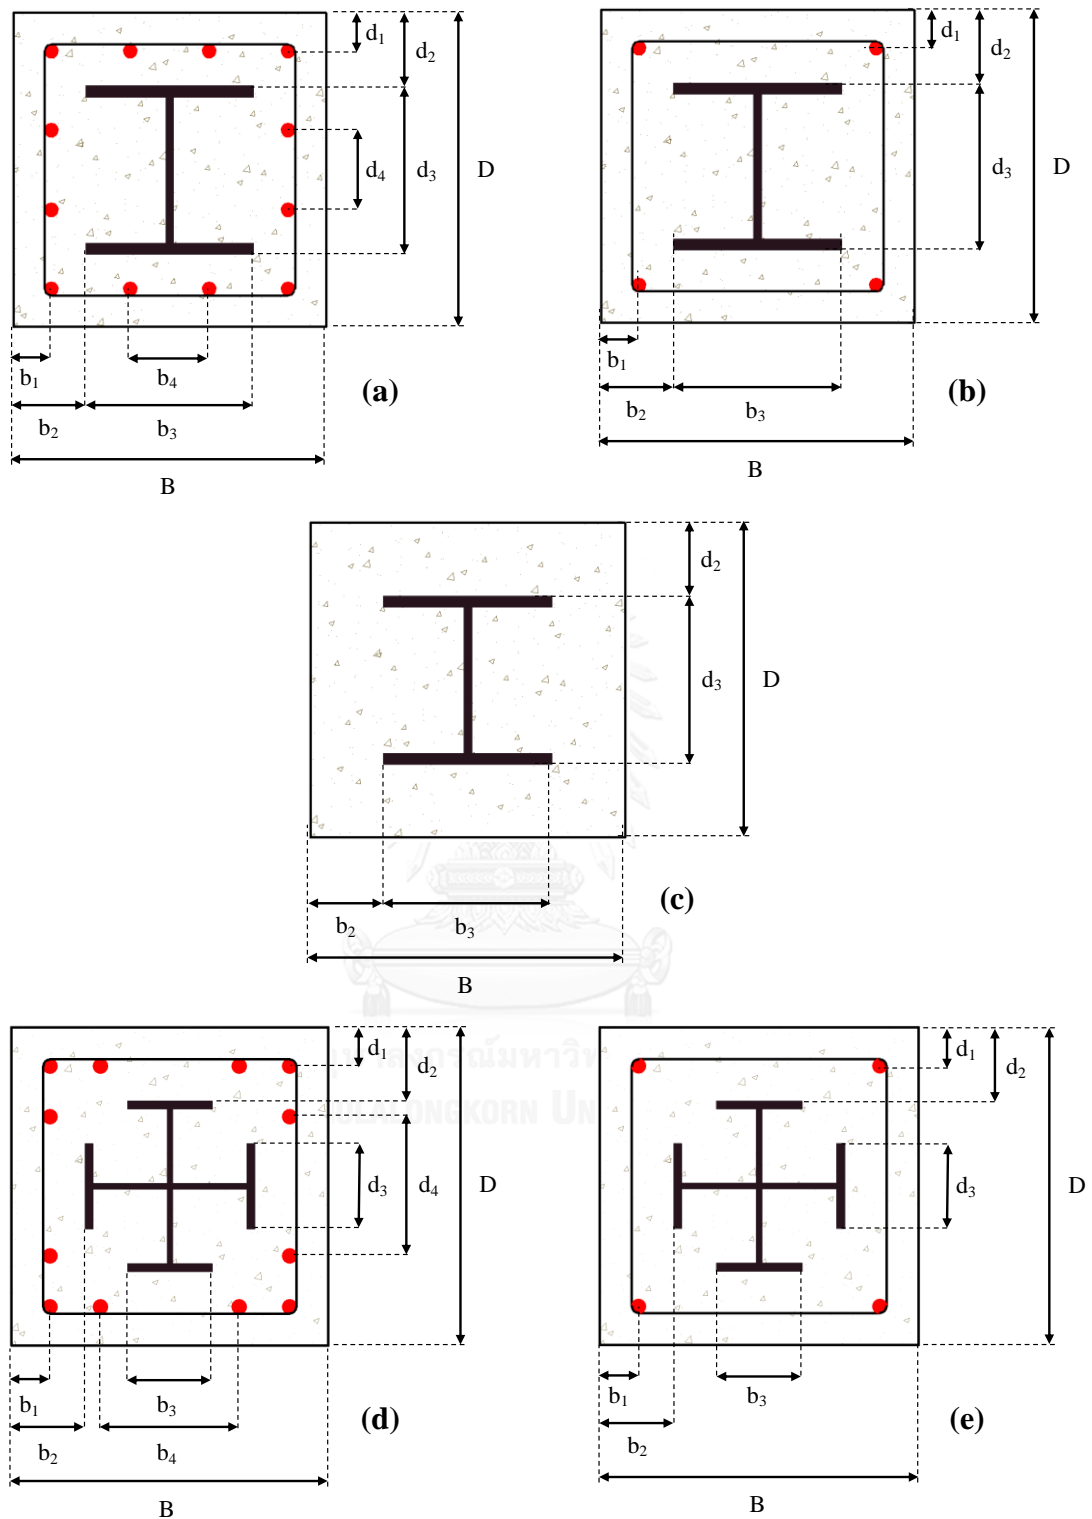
Cross-section configurations of CES columns (a) H-, I-shaped with distributed rebar, (b) H-, I-shaped with corner rebar, (c) H-, I-shaped without rebar, (d) Cross-shaped with distributed rebar, and (e) Cross-shaped with corner rebar.
